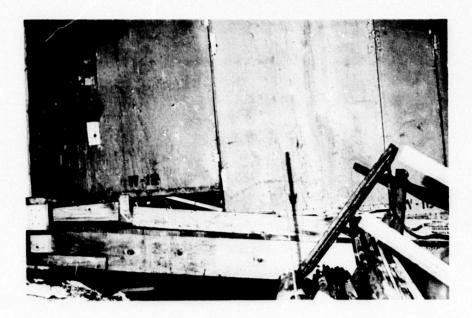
Displaced walls and floor at front entrance to maintenance shop, Trench 21.
